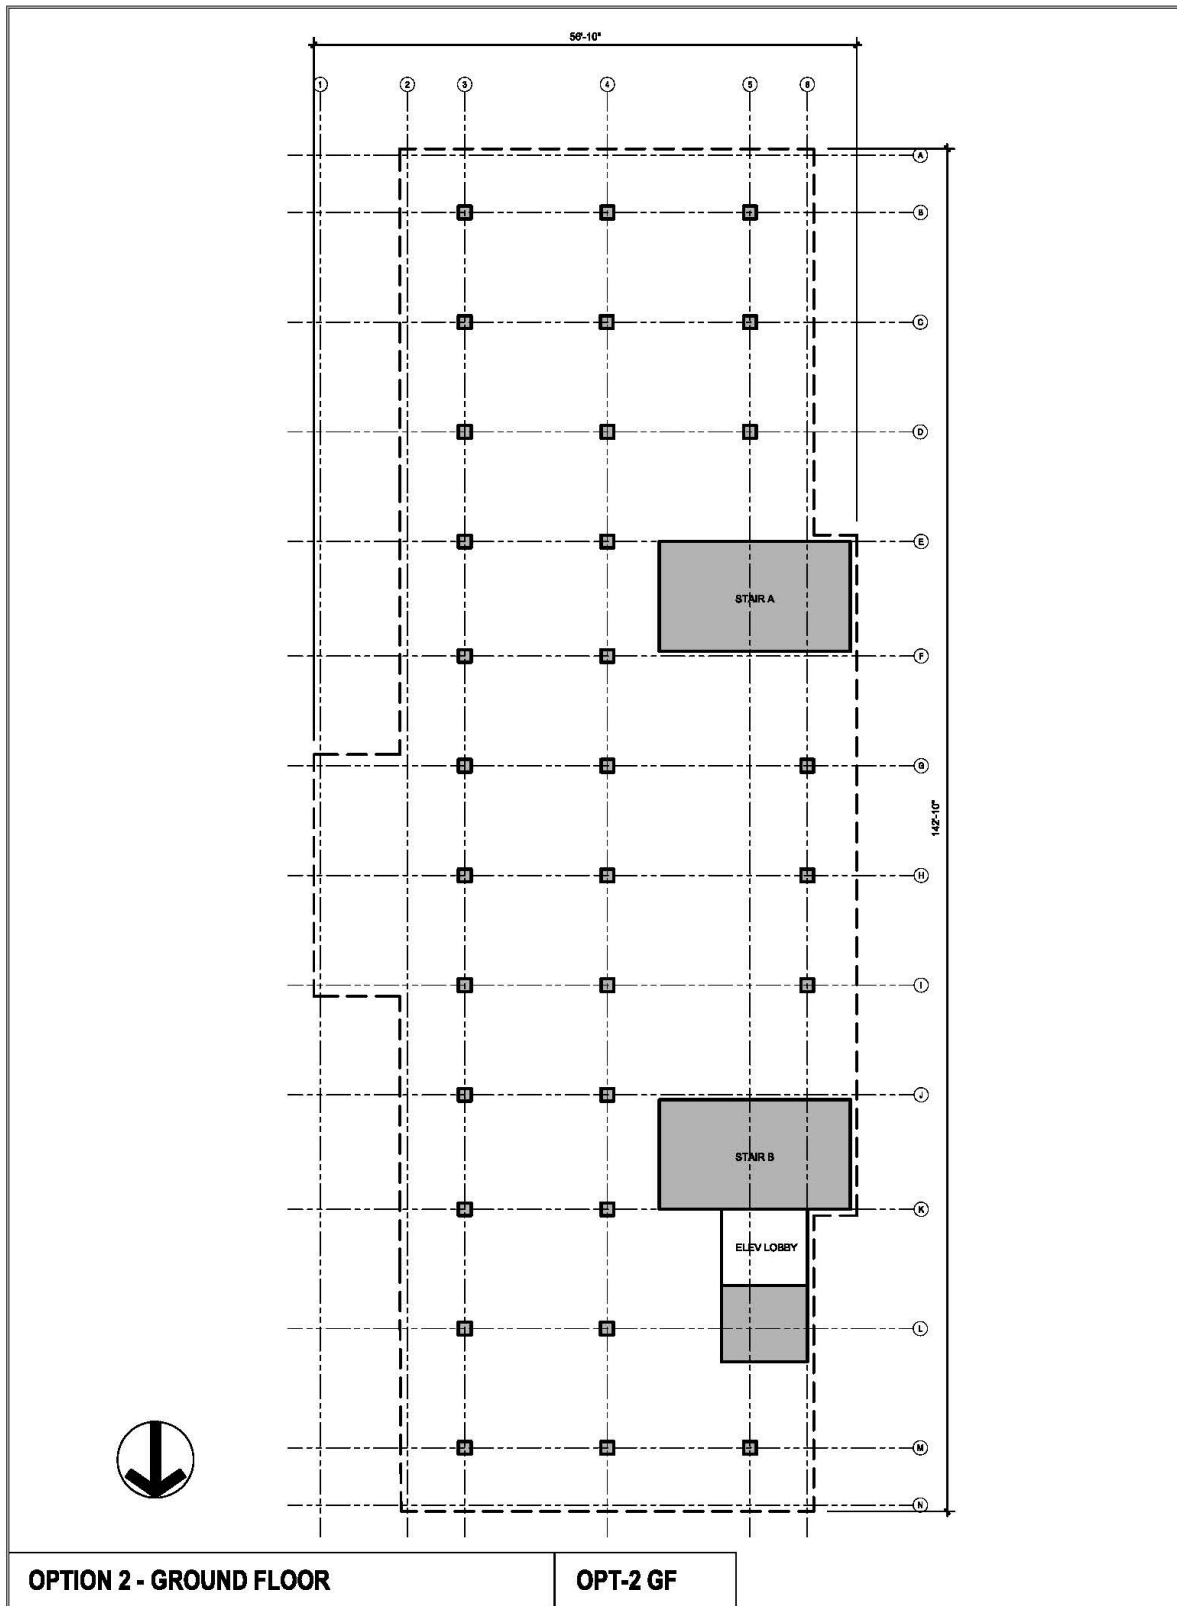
Pre-Design Building Option 2 - Ground Floor
